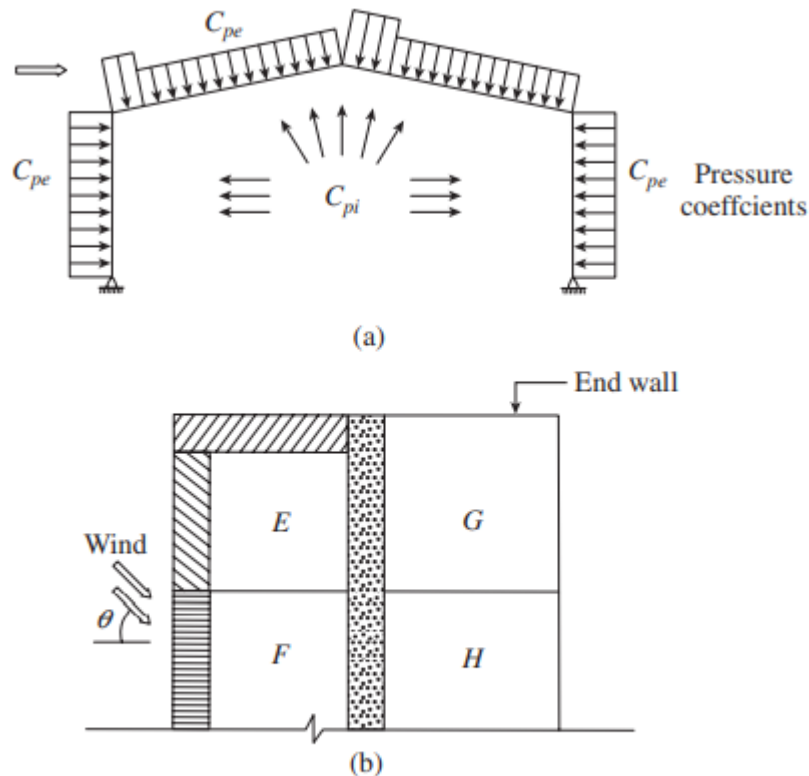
Typical industrial building elevation along with the wind pressure coefficients (a) Typical elevation with wind pressure coefficients C_{pe} and C_{pi} (b) Half plan
